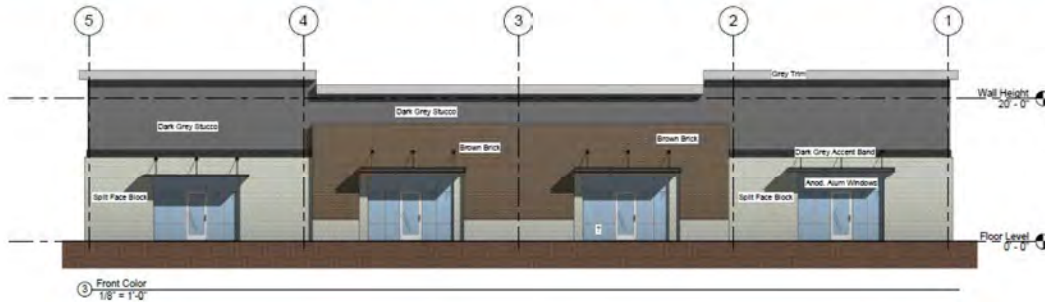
Multitenant retail/office building front (main entrances) elevation.
